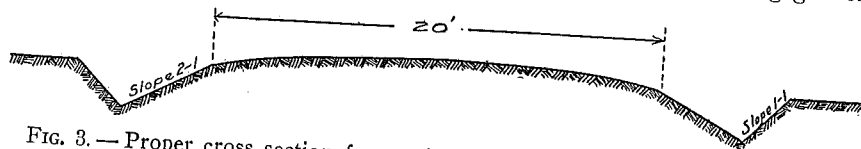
Proper cross section for road in loamy soil. Crown 1 inch per foot.
